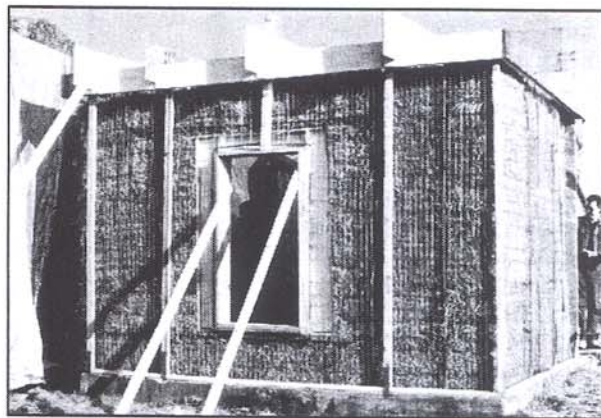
Straw bale wall with mesh, rebar and spar steel ready for gunite.
